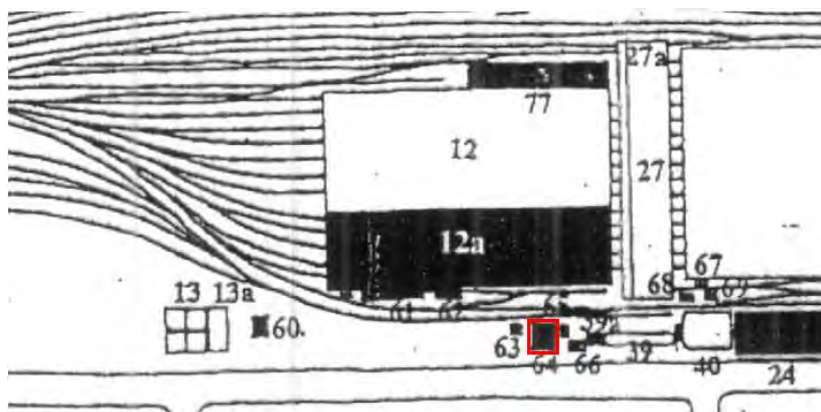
Buildings indicated on site within the North Eveleigh Paint Shop Sub-Precinct by 1927. Compressor House c.1913-1920 outlined in red. (Source: DPWS)
